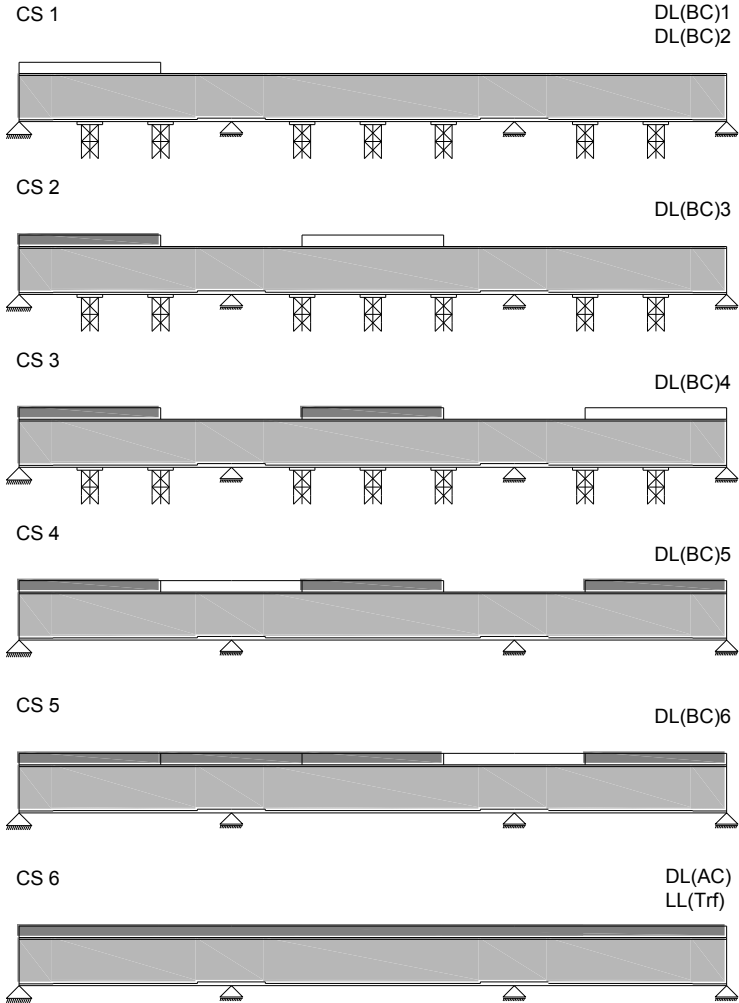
Schematic representation of Propped bridge alternate slab concreting
